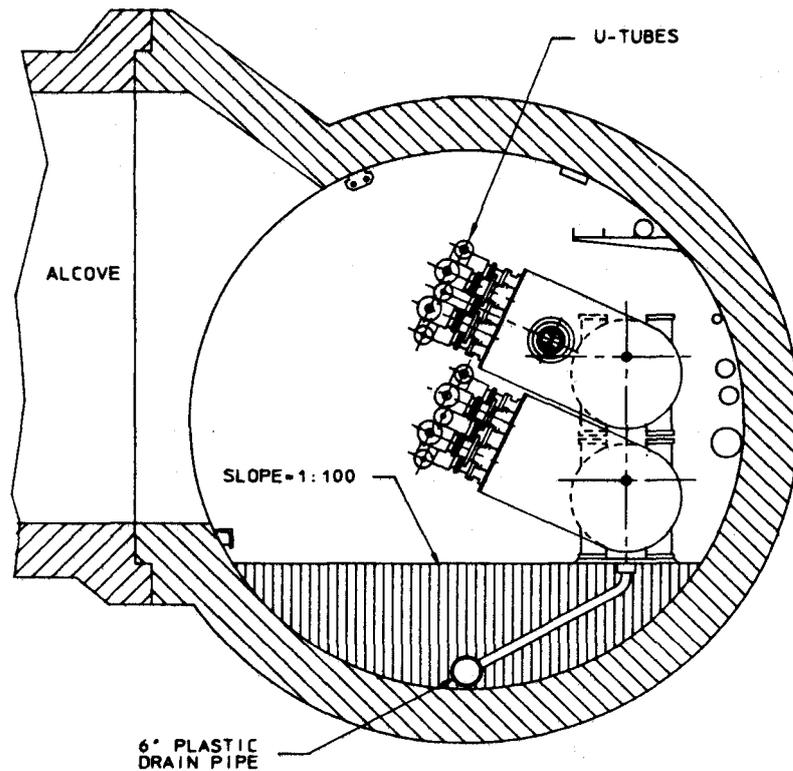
Cross section of collider tunnel at cryogenic disconnect.
